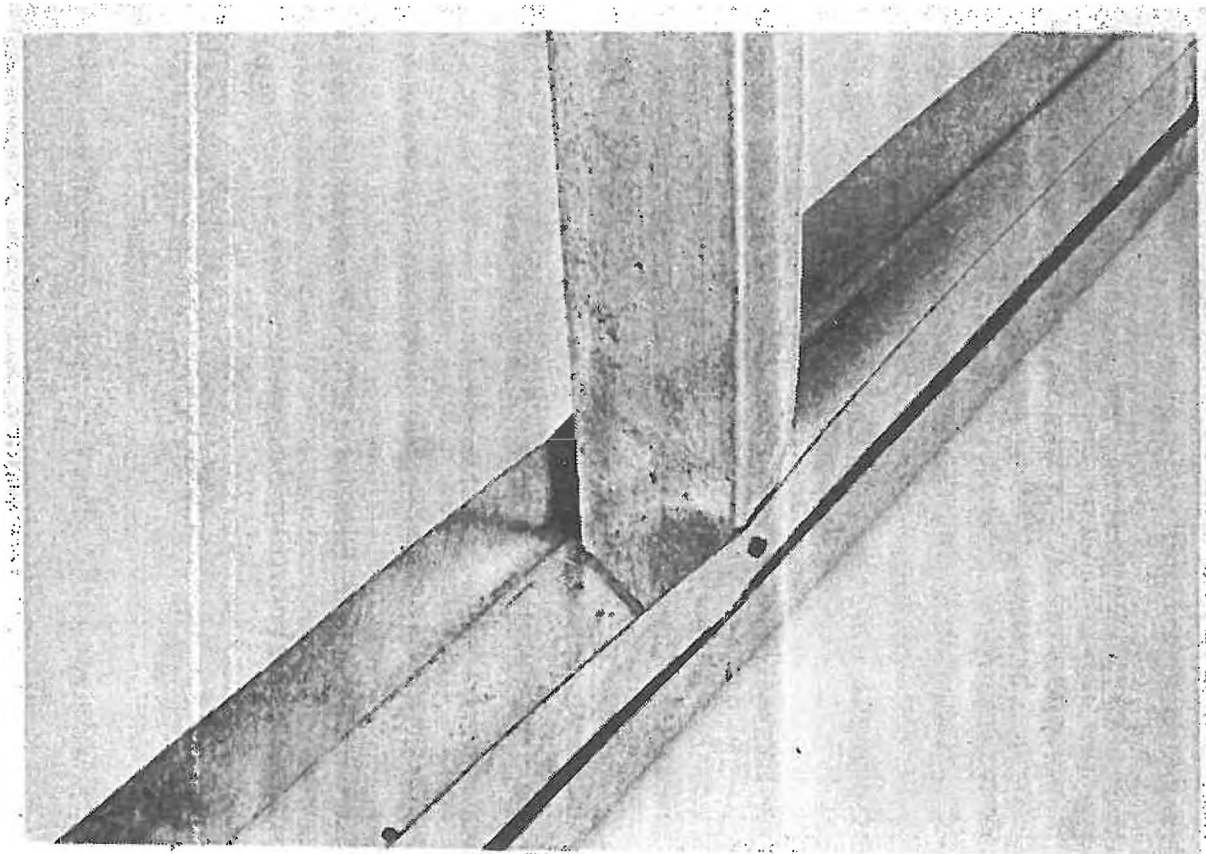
Photograph of Typical Failure of 20 Gauge, 90 mm
